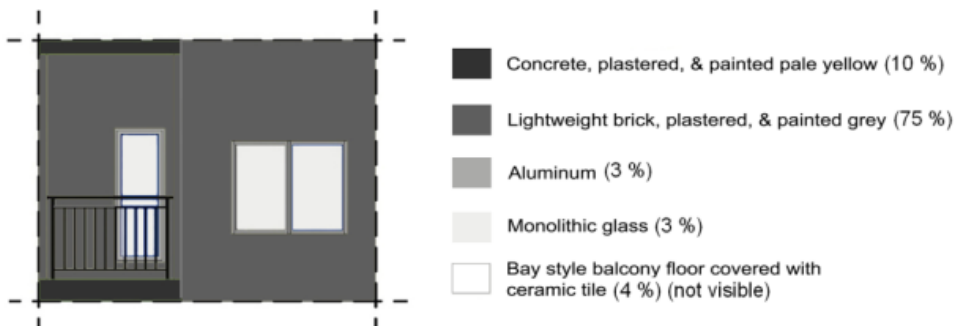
Façade of apartment units with glass windows on plain wall and glass door in a small balcony (C apartment).
